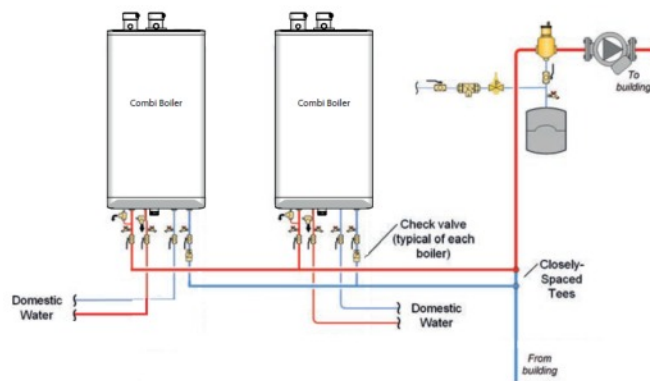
Multiple combi boiler piping concept – concept drawing. This drawing is only a simple schematic guide.
